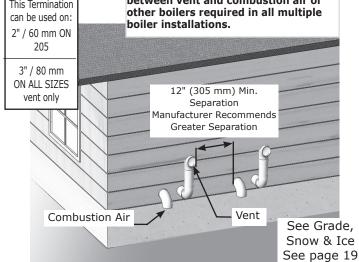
(3" / 80 mm ONLY) Single Wall Exhaust Kit and Air Intake Minimum Distance Center to Center
